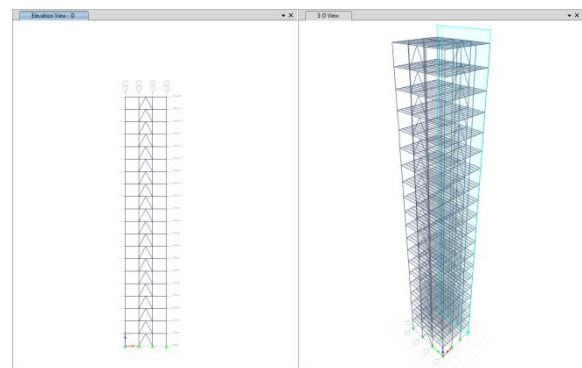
Elevation and 3D view of the building with inverted V bracings at center bay
